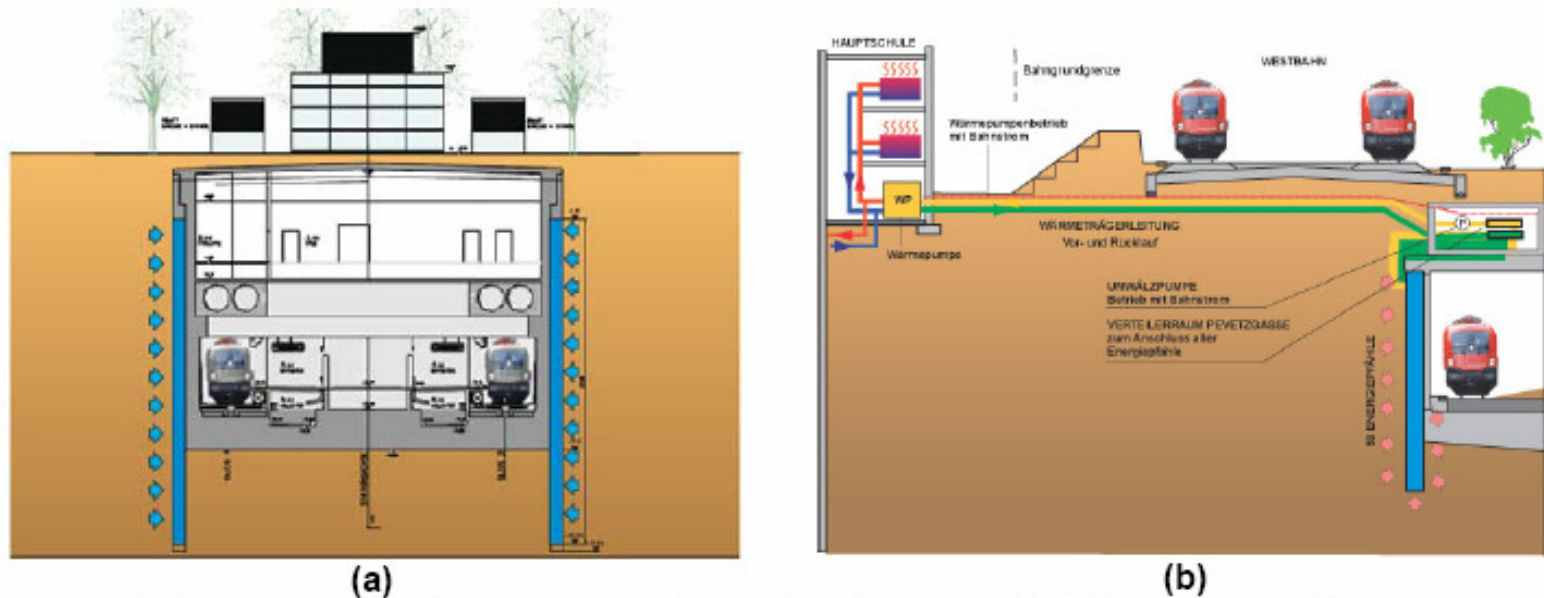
Underground railway station (a) with diaphragm walls (Vienna, Austria), and Lainzer tunnel (Vienna, Austria) with piled retaining wall with piles (Source: Enercret®, Project sheet)
